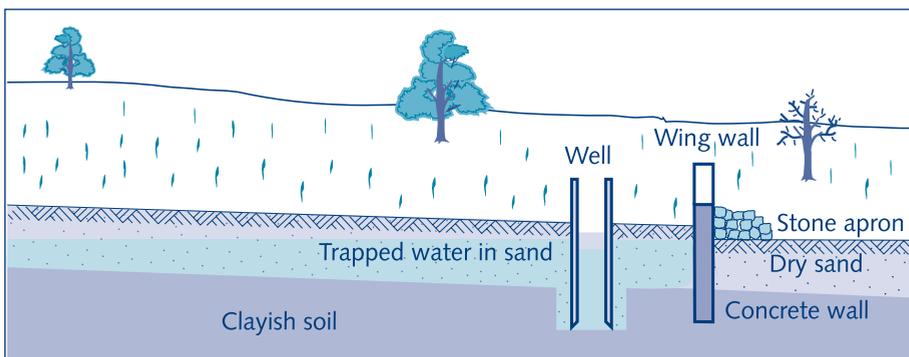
Sub-surface masonry dam (Adapted from Nissen-Petersen, E., 1986)
